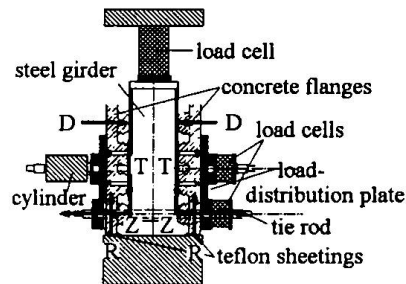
Sectional view of test set-up and specimen for push-out tests.
